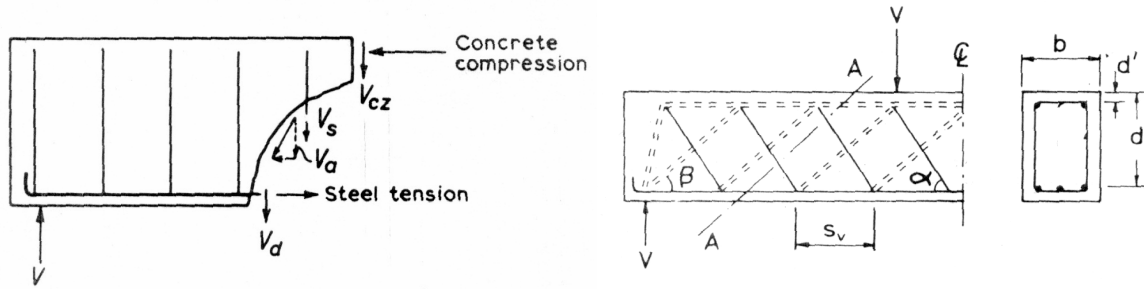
A simple beam with cantilever loaded at top with truss analogy model [2]
